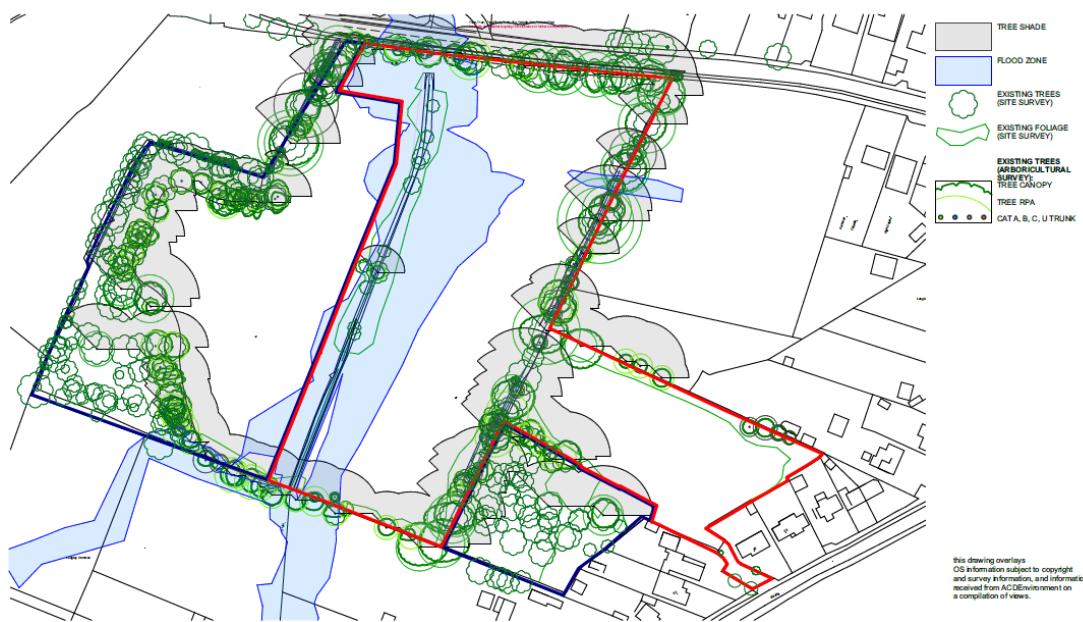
Site Constraints Plan (drawing ref. 2901 003P7)
